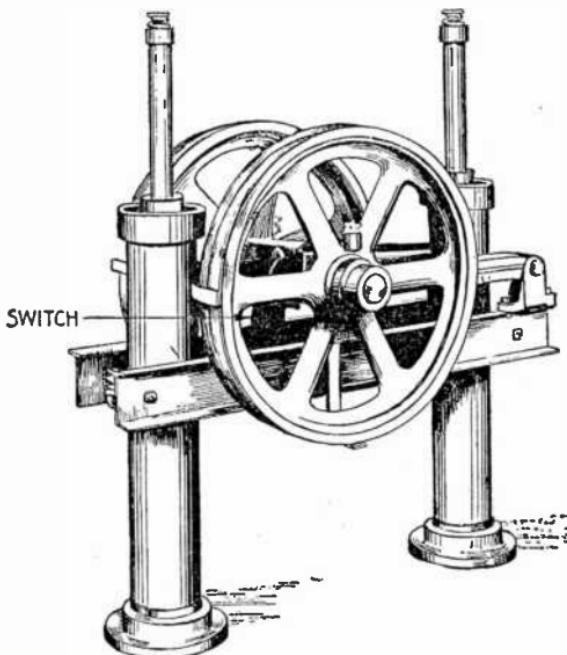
,842.—Elevator compensating rope sheaves with switch.
